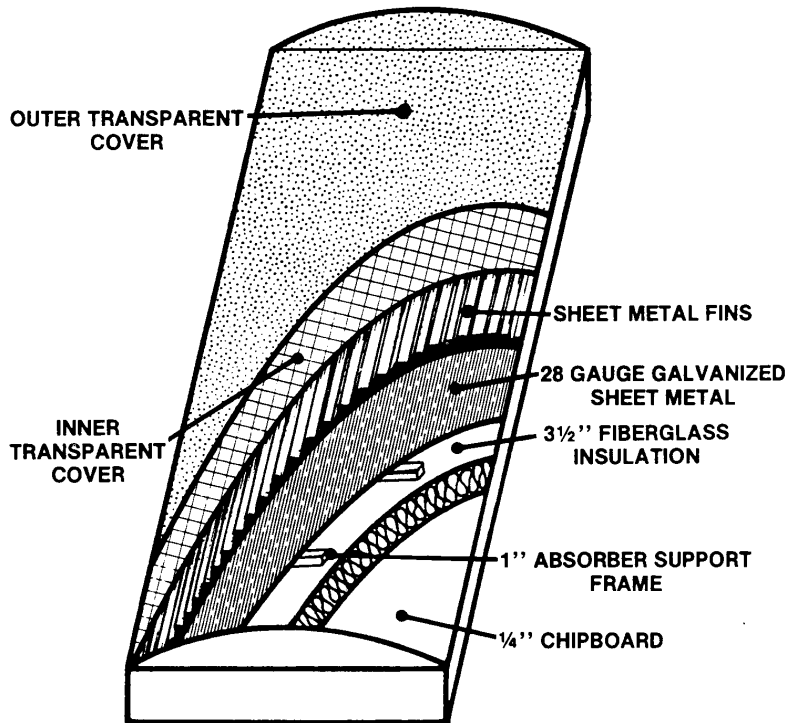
CUTAWAY OF AIR COLLECTOR
